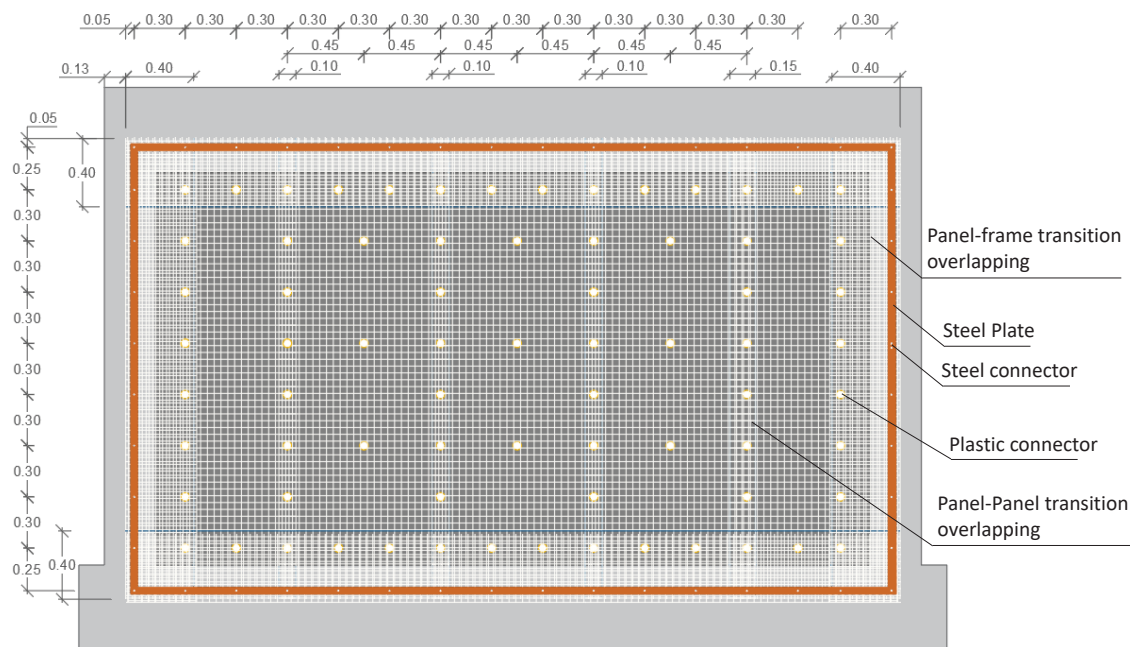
Schematic layout of the strengthening solution of the wall LWC_S.
